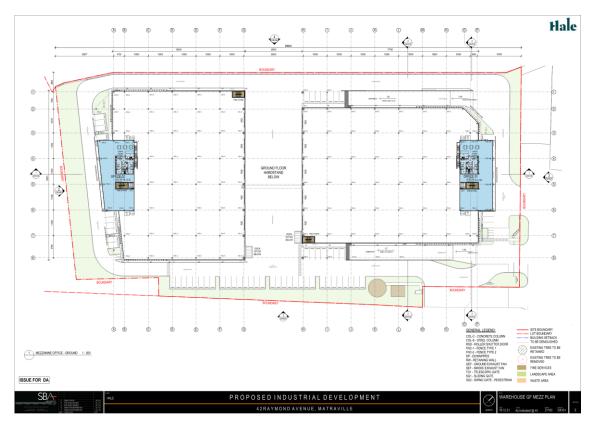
Proposed Development (First Level) – Concept Layout Plan
